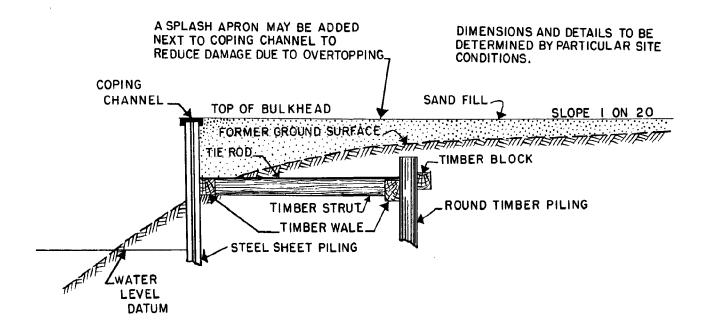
Typical Steel Sheet Pile Bulkhead
